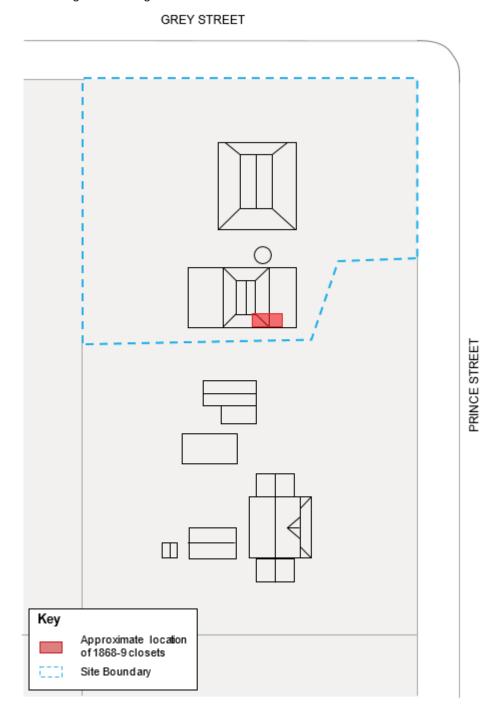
Current site plan of the Clarence Town Courthouse site, with the approximate location of the closets constructed in 1868-9 which were demolished prior to 1970.
